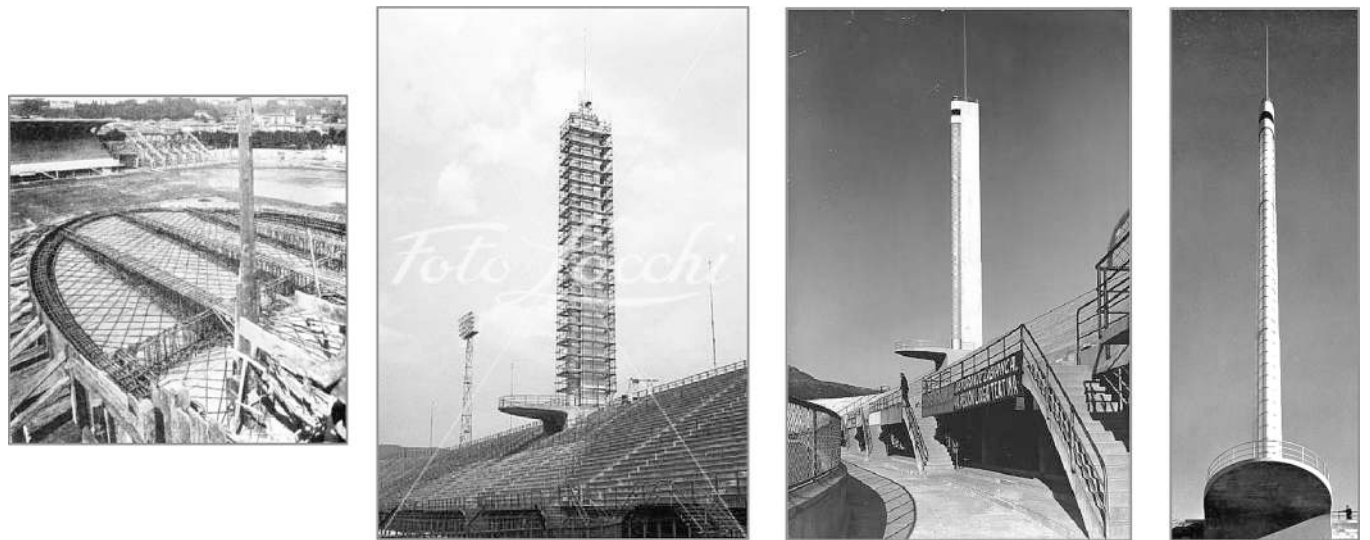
Views of the reinforcement of Maratona Tower balcony (photographic archive Locchi, Florence), and images of the Tower during (idem) and at the end of construction works (photographic archive Barsotti, Florence).
